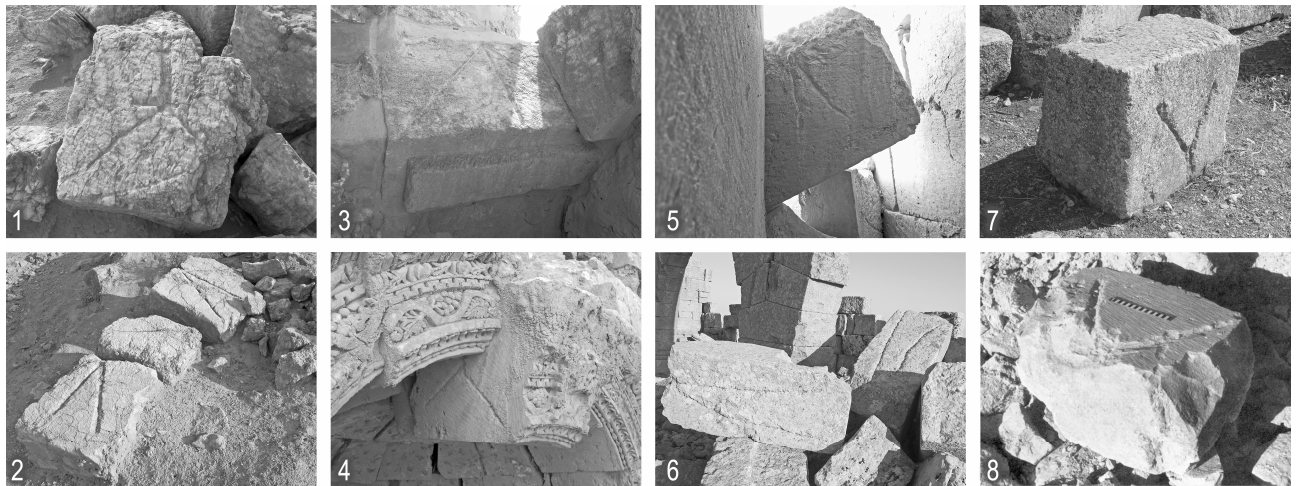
Voussoirs with grooves. Resafa, city wall, North Gate, debris (1), Resafa, city wall, West Gate, debris (2), Resafa, city wall, tower 43, *in situ* (3), Resafa, Tetraconch Church, baptistery, *in situ* (4), Resafa, Basilica B, staircase (5), Brad, Northern Church (6), Qal'at Sim'an, Church of Saint Simeon (7), Qasr al-Hayr ash-Sharqi, Small Enclosure; (Grabar 1978, p. 18 Fig. 43) (8)
